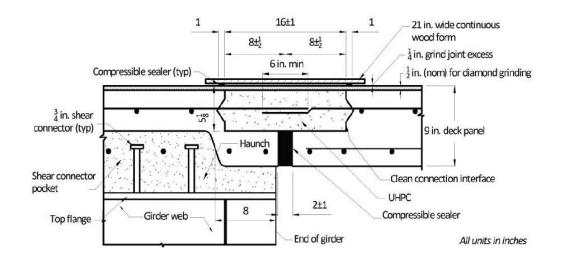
UHPC Link Slab Connection Detail on SR962G Bridge in Owego, NY (Graybeal et al. 2014)
